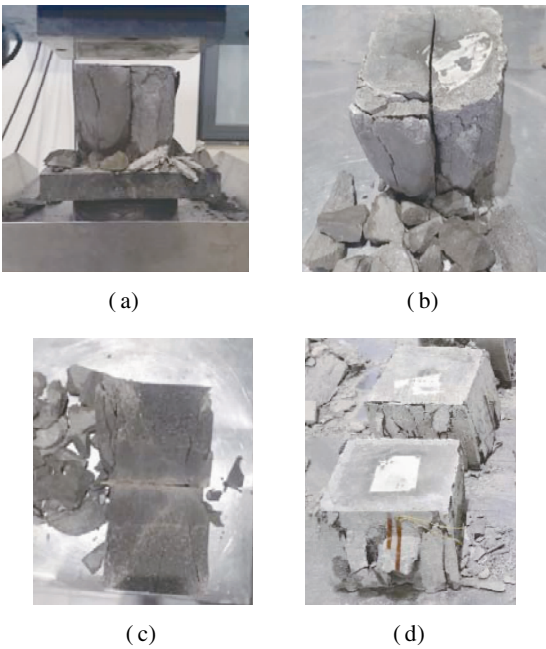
Failure modes of a cubic concrete specimen. (a) Failure mode of cleavage; (b) Failure mode of crush; (c) Fracture surface of the cleavage; (d) Failure mode of the specimen with steel fibers
